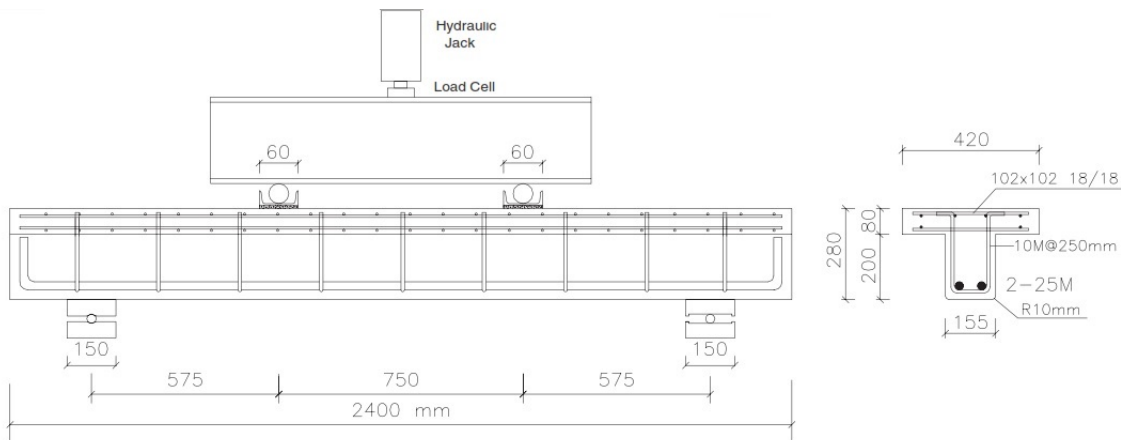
Dimensions and Details of Reinforcement of the Beams (Galal and Mofidi, 2010)
